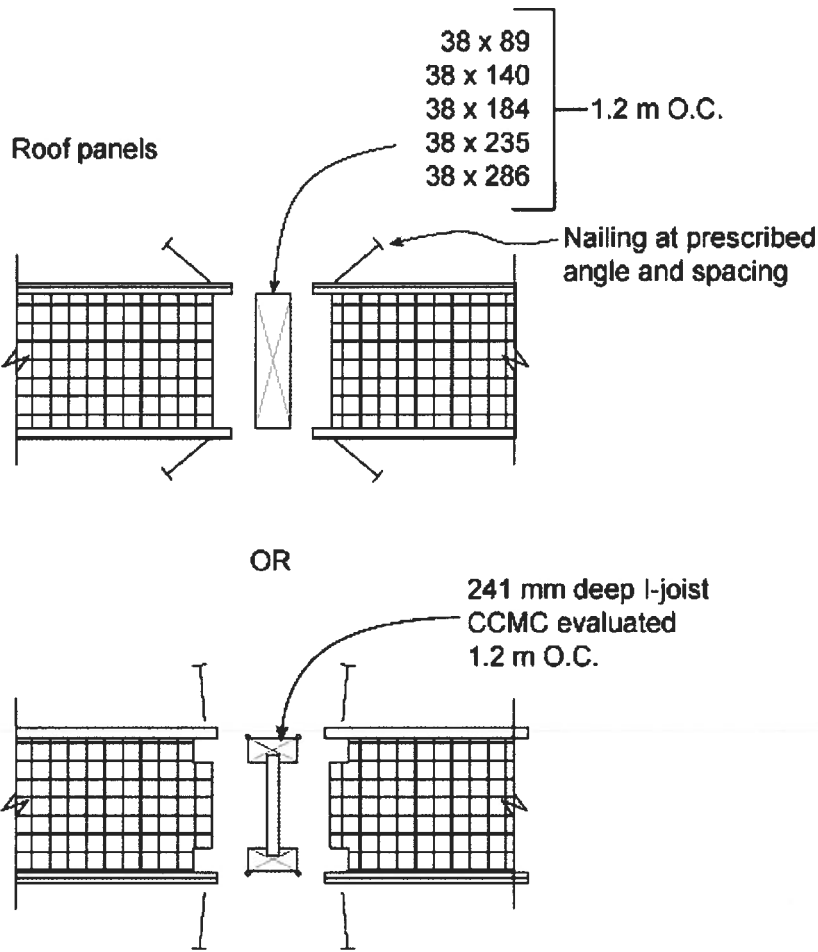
“Insulspan SIP System” – structural roof panels with lumber or prefabricated I-joists at 1.2 m o.c. See manufacturer's details for sealant and tape requirements
